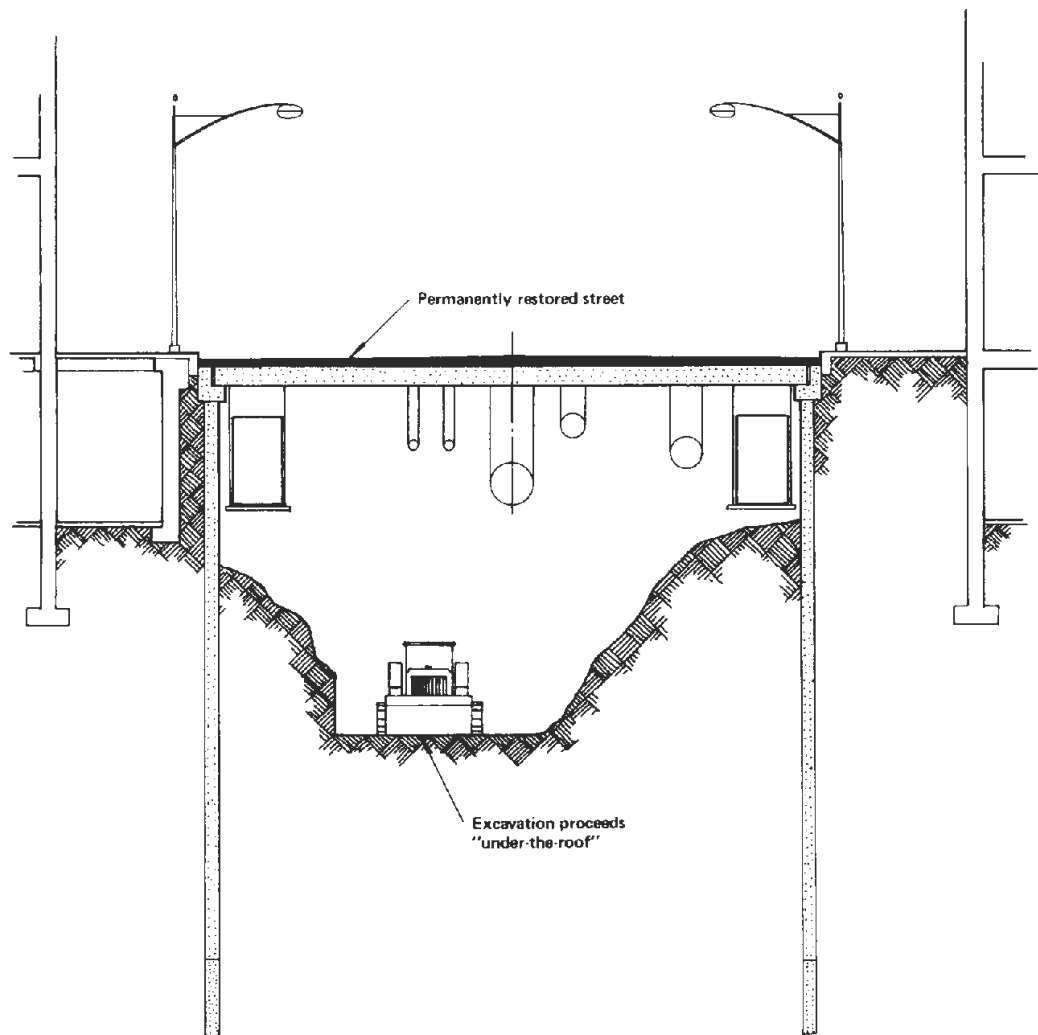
Step 11: Restore street and open to traffic. Note: 9, 10, and 11 can be carried out under accelerated scheduling to reduce the time that street is closed. Step 12: Excavate from below with front end loaders, dozers, and trucks.
